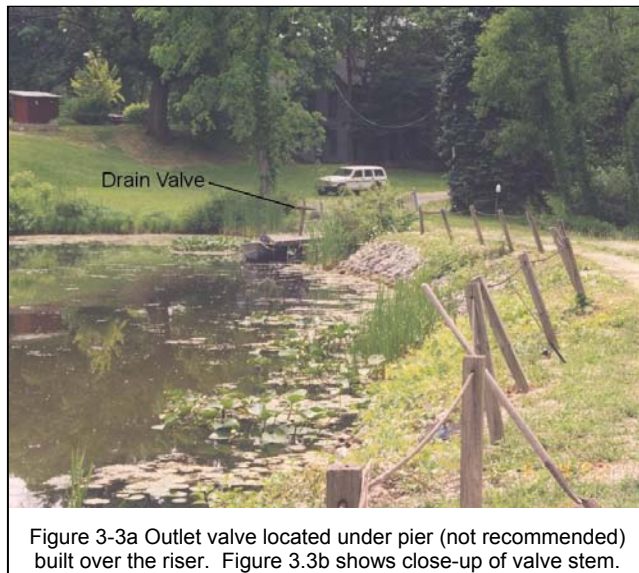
Outlet valve located under pier (not recommended) built over the riser. Figure 3.3b shows close-up of valve stem.
